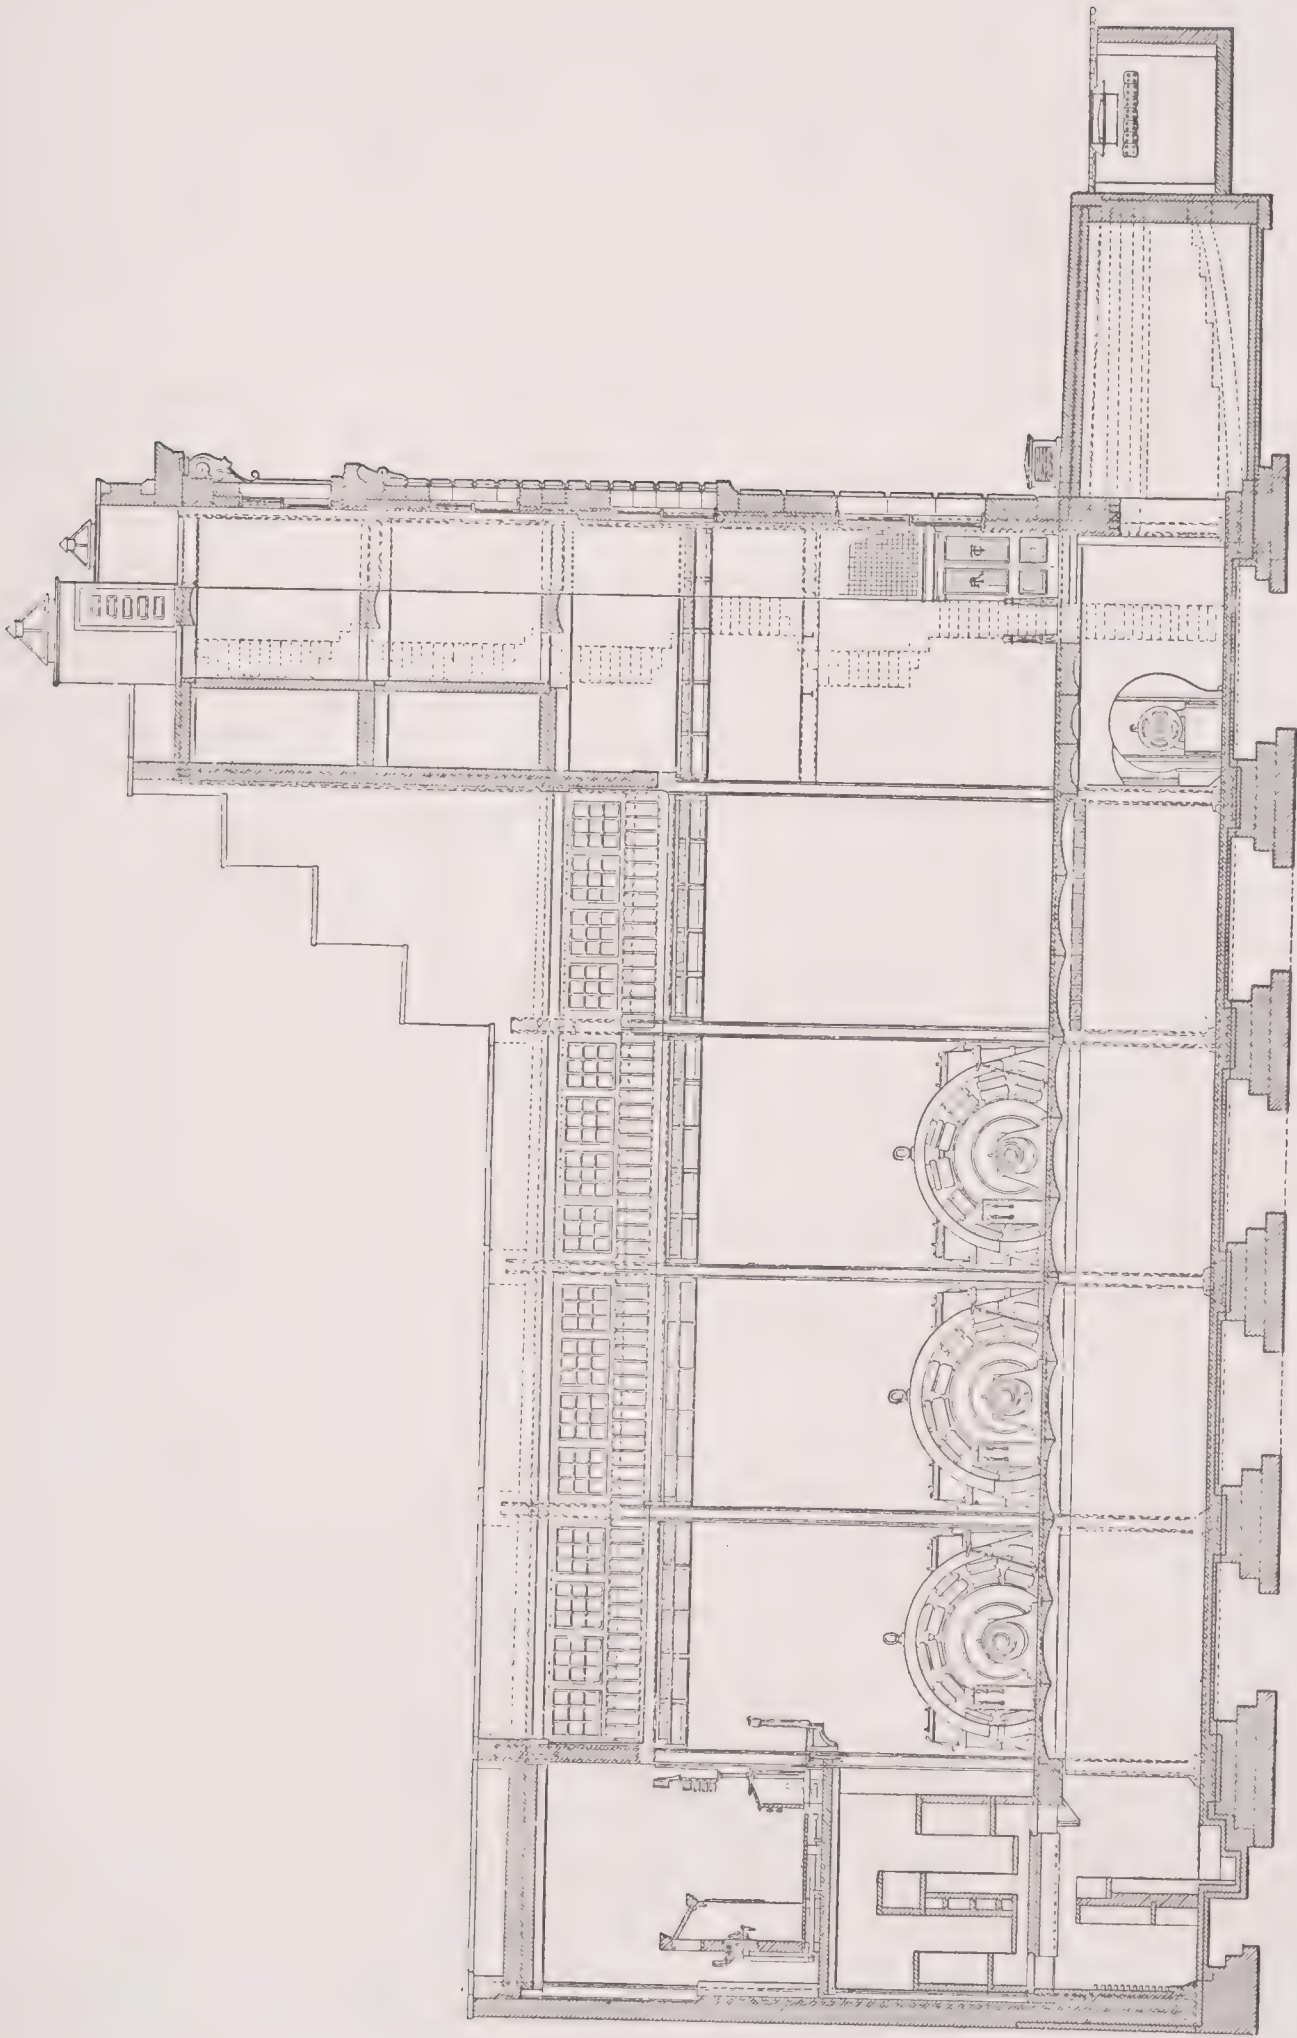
NEW YORK SUBWAY : LONGITUDINAL SECTION OF SUB-STATION NO. 14.
